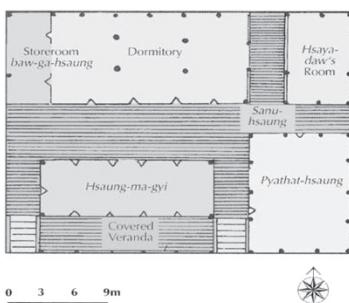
Plan of Taing-Tayar Kyaung^{*8}
